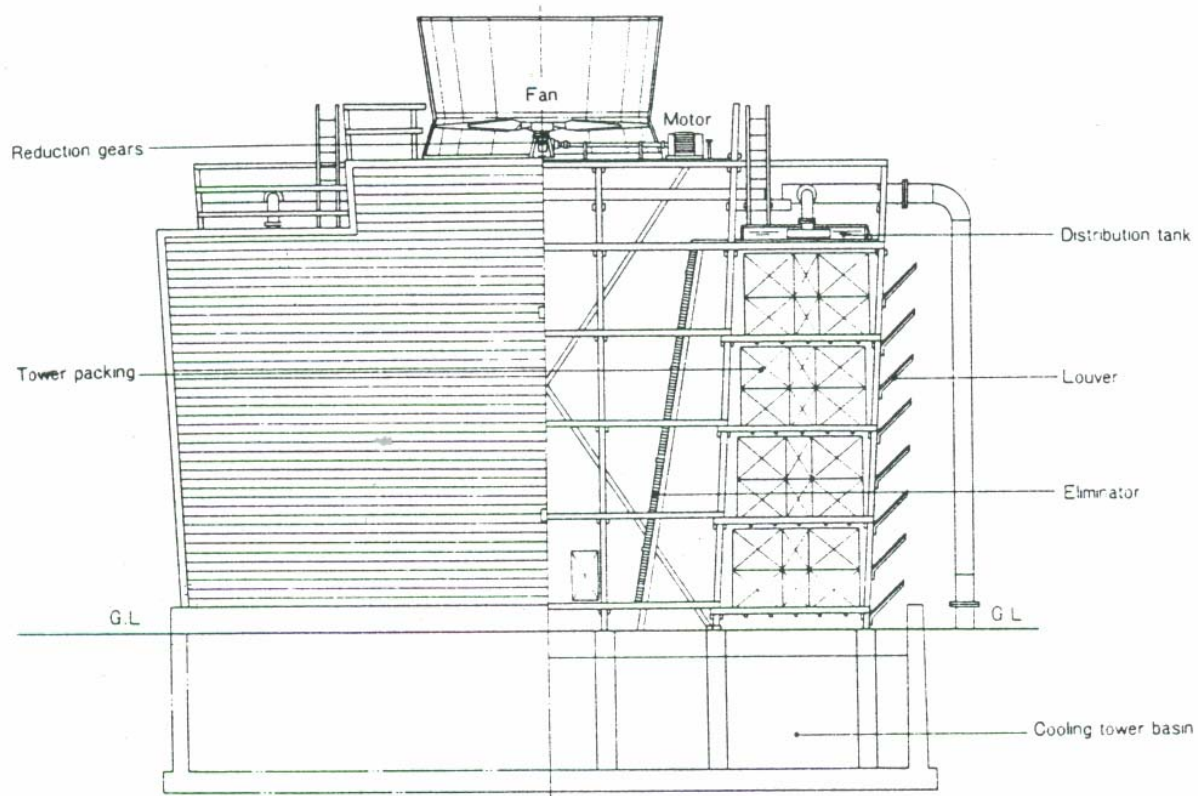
Cooling tower in a large size cooling system (induced draft cross flow type)
